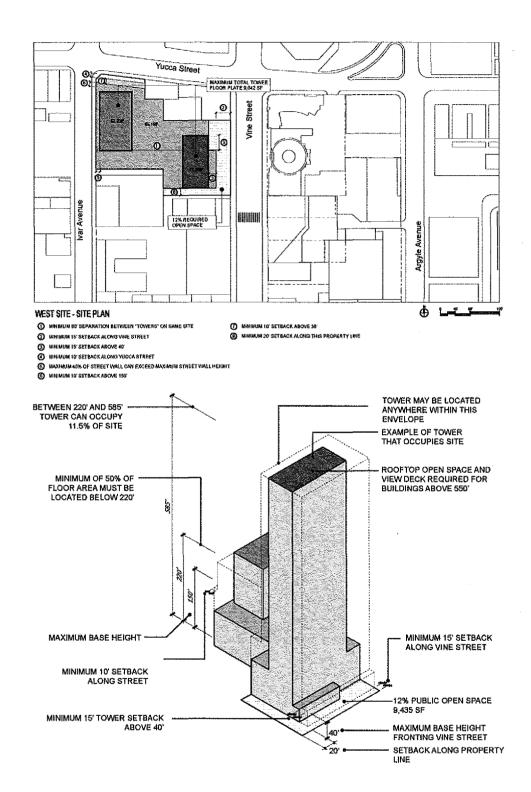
d.2: West Site - 585 Feet Maximum Tower Height
